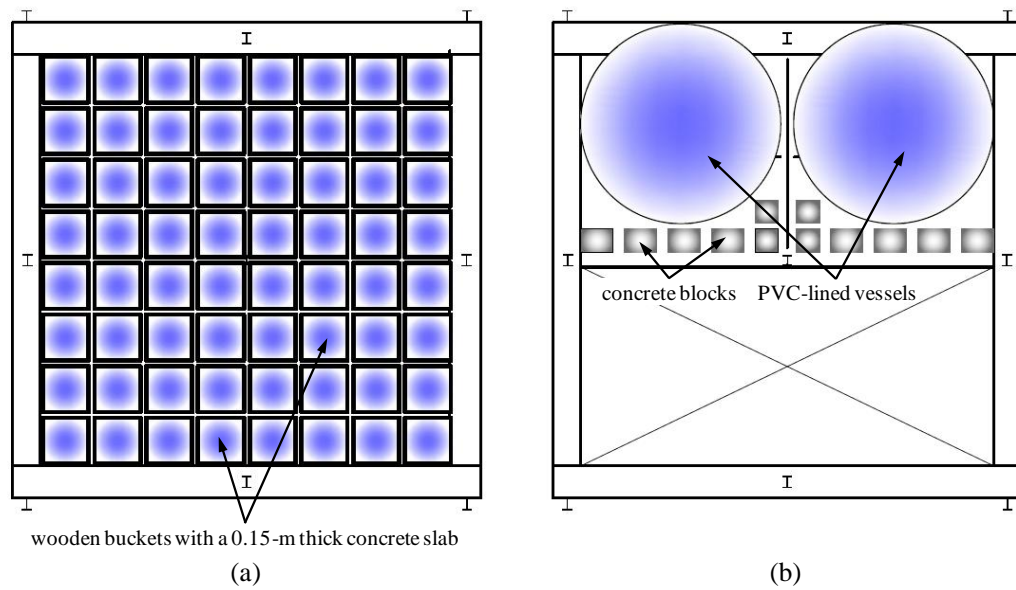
Plan view of the loading system: (a) ICL specimen, (b) ECL specimen
